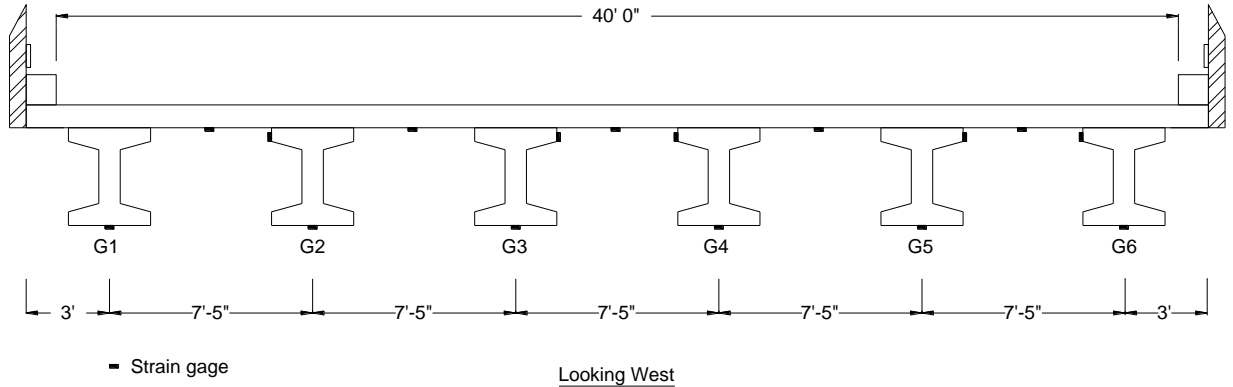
Typical instrumentation layout at midspan for both LWFA bridge end spans
